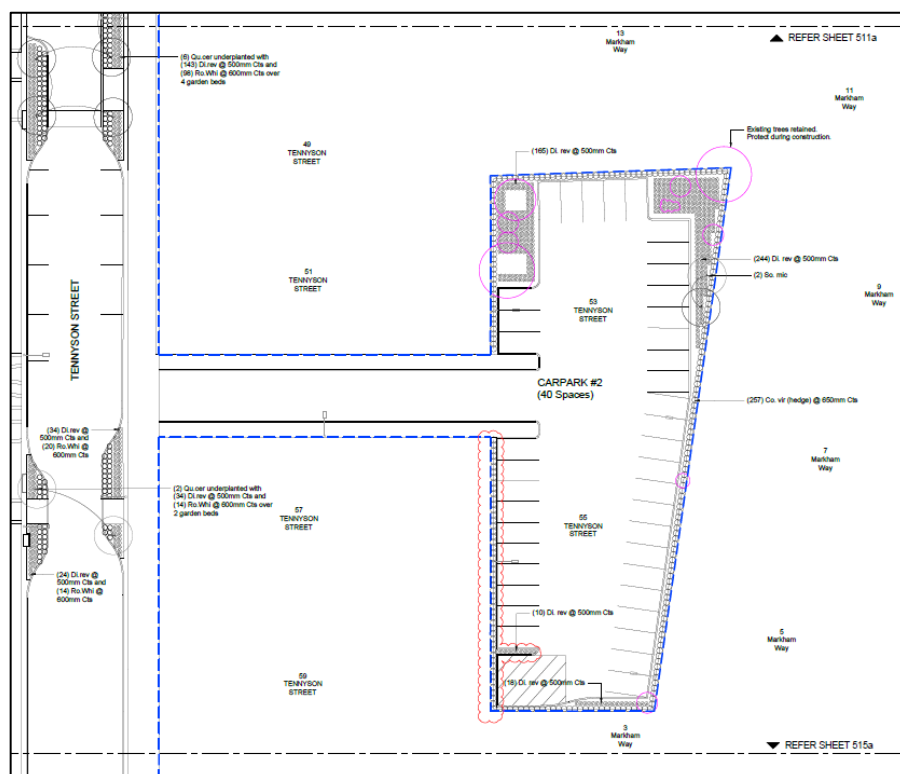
Landscaping for the carpark. Source: Applicants landscape plan
